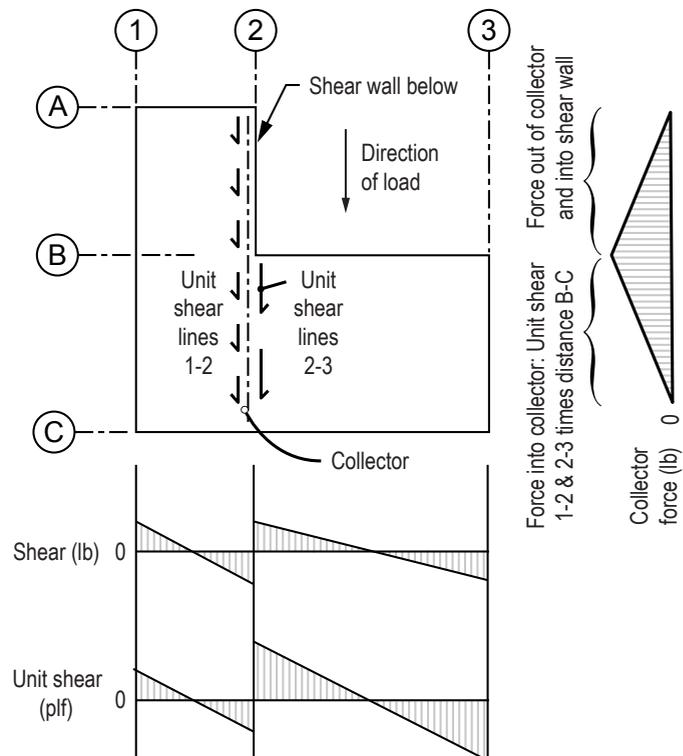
Plan view of diaphragm with its collector force diagrams.
